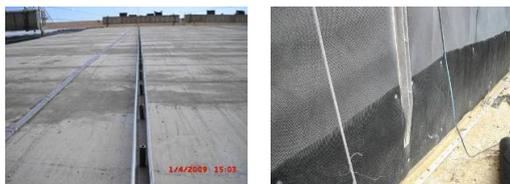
Boussiaba RCC Dam, Algeria 2009. At left, the U profiles installed external to the dam, on the completed RCC lifts. At right, detail of the drainage geonet placed on the upstream face, and of the drainage geonet band placed as longitudinal drainage collector at heel.
